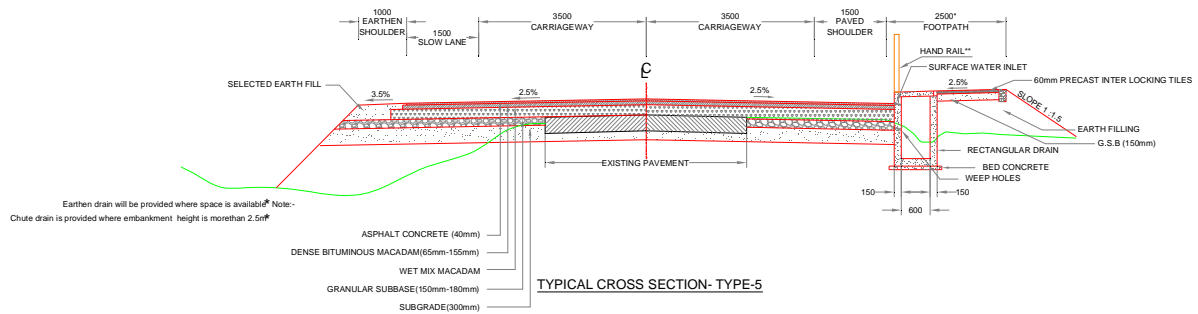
TYPICAL CROSS SECTION- TYPE-5
